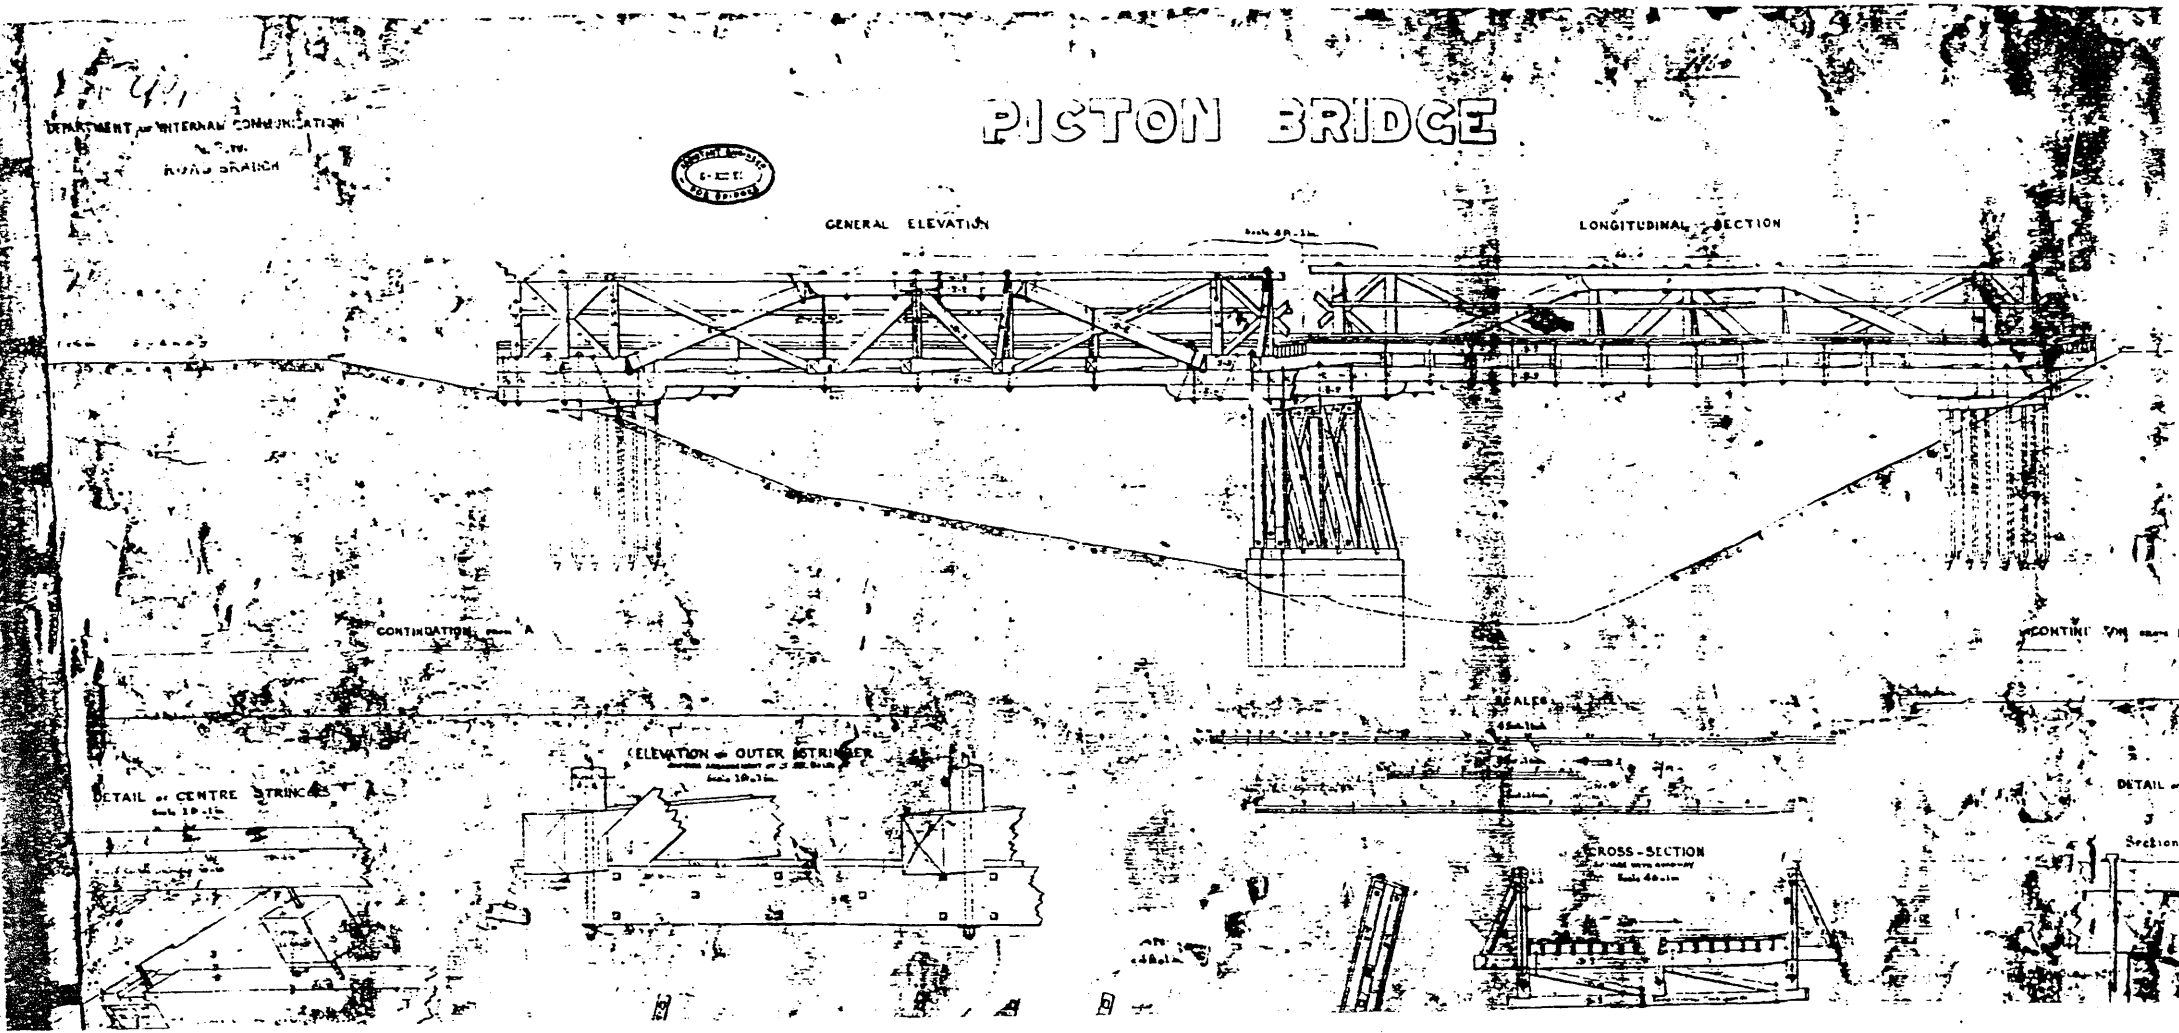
The 1861 timber truss bridge over Stonequarry Creek, Picton was built by J Sorrie & Co.
